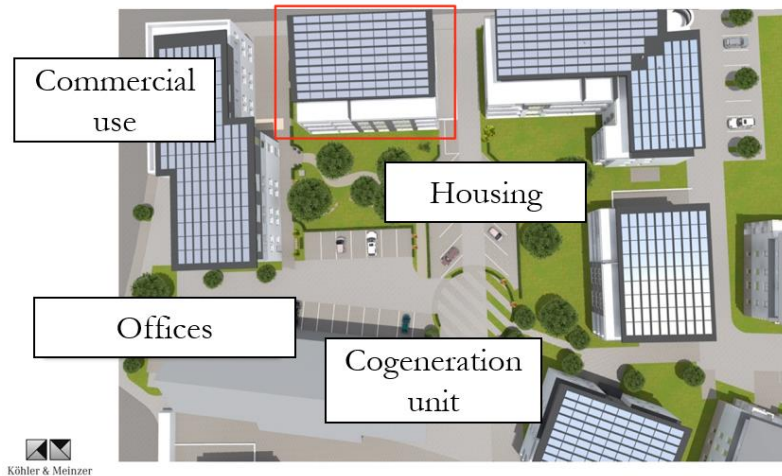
Overview of the quarter, all shown buildings are connected to the local heat and power plant and have PV
